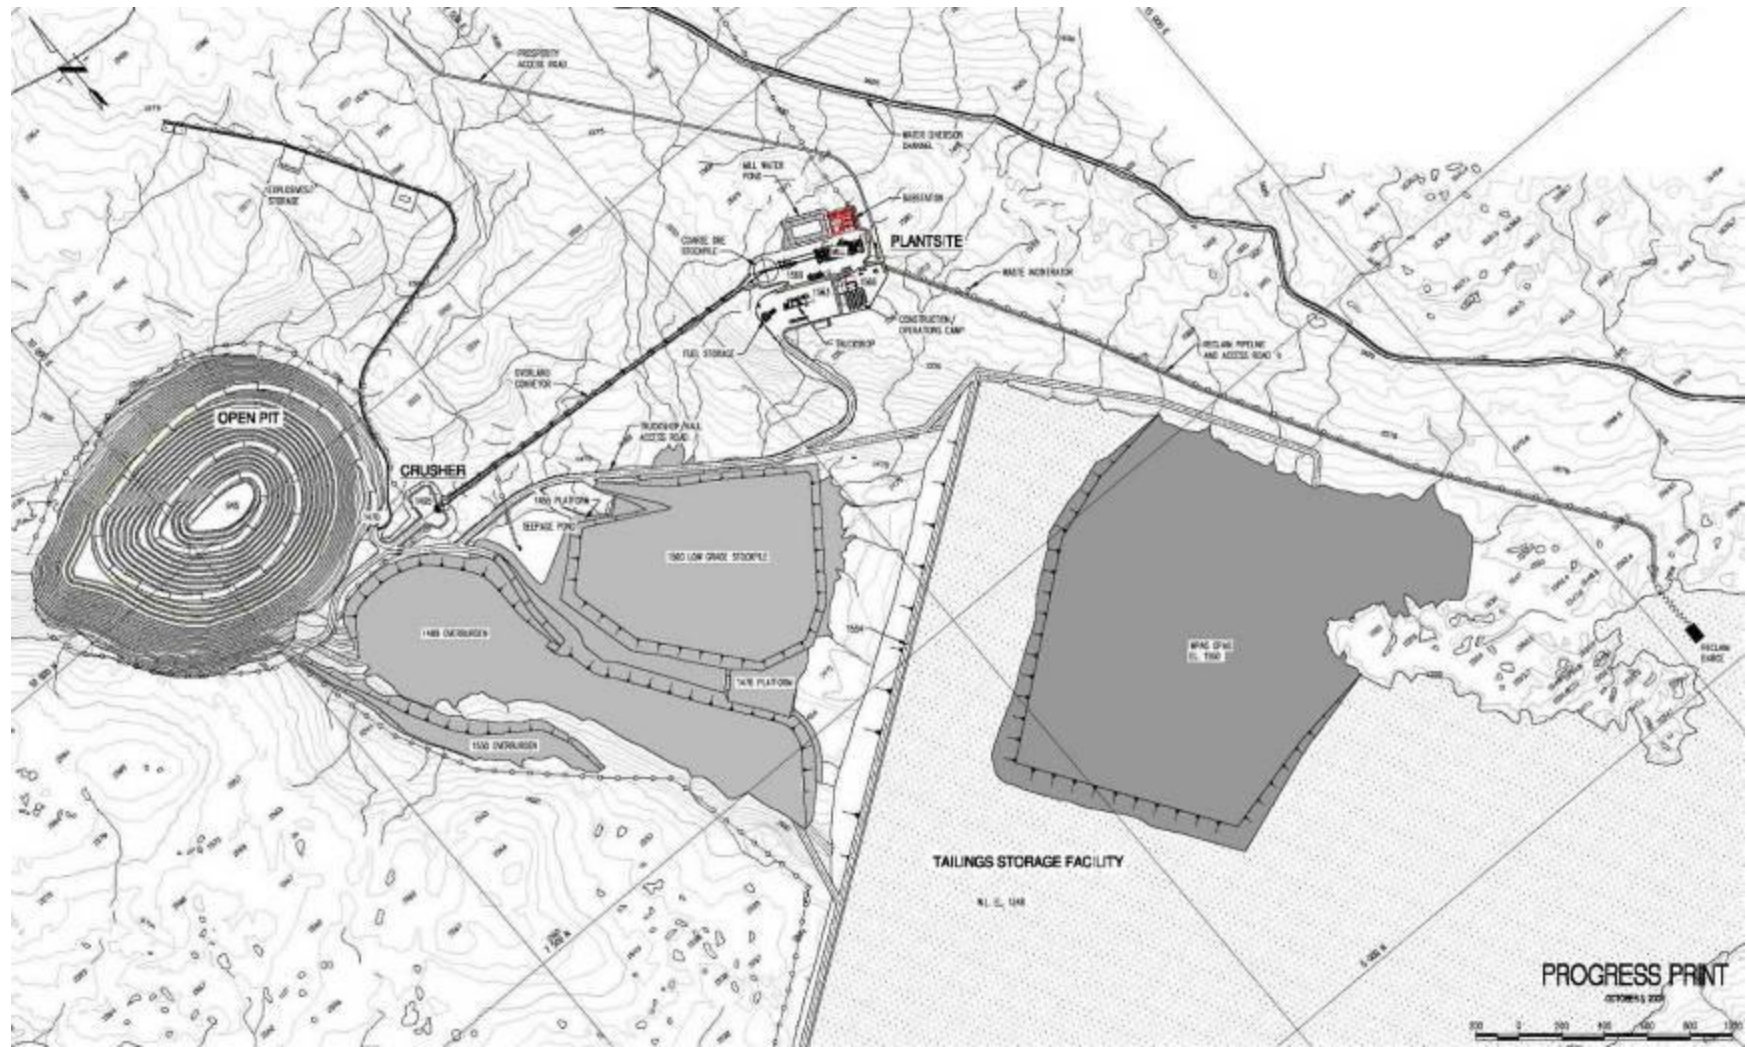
Pit and Stockpiles Plan-End of Year 16
